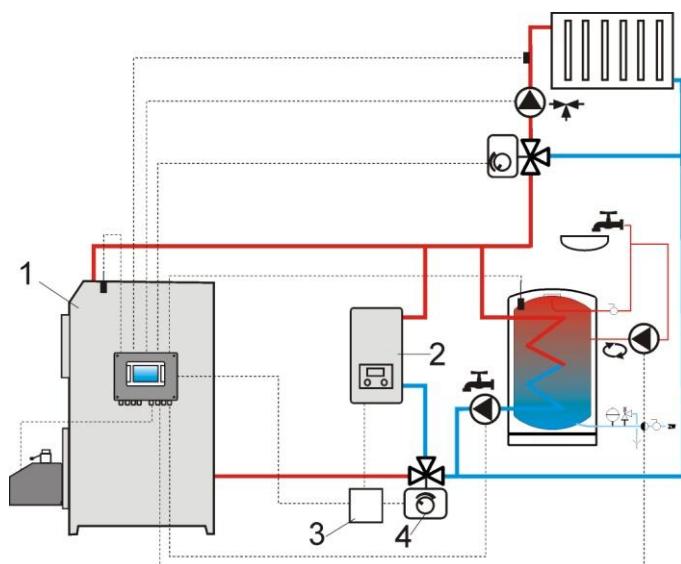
Example of a hydraulic connection with a backup boiler (2), relay (3), and switching valve (4)
